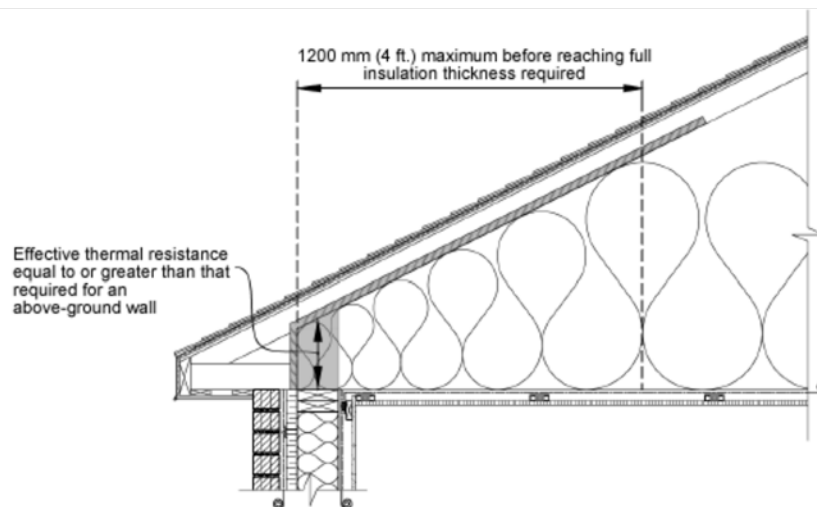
ROOF EDGE DETAIL / SOURCE: SHQ
